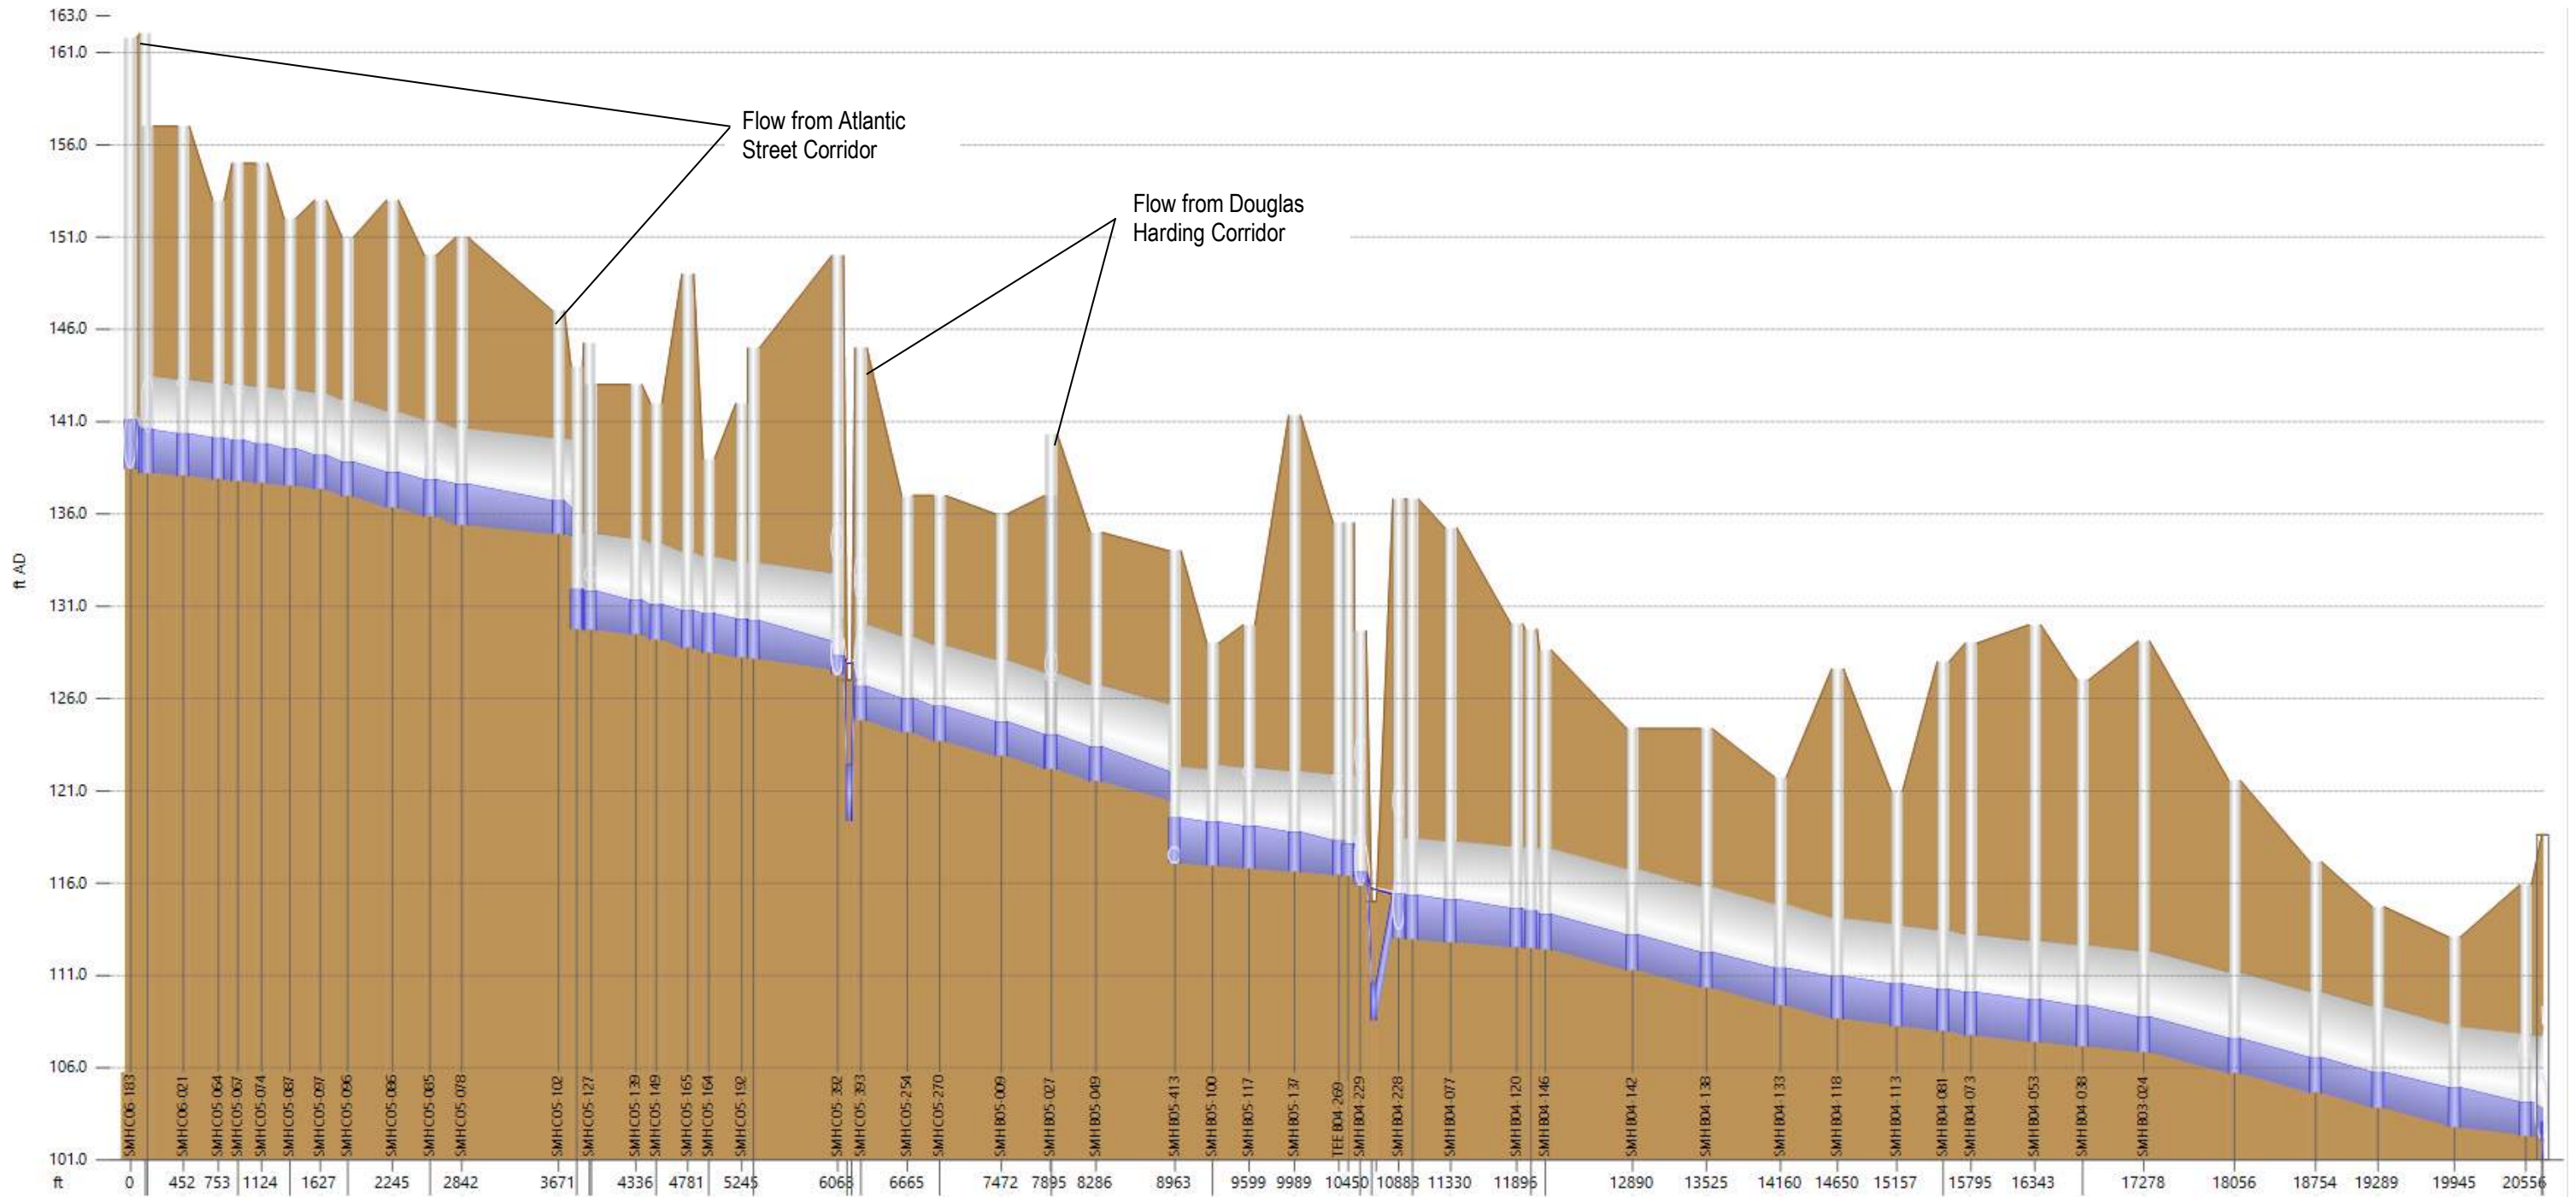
Cirby Creek Trunk B Hydraulic Profile (Existing Rebound plus Specific Plans Design Storm Results)
